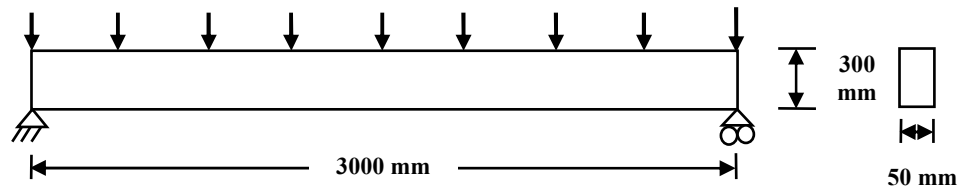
Dimensions, loading and boundary conditions of steel beam
